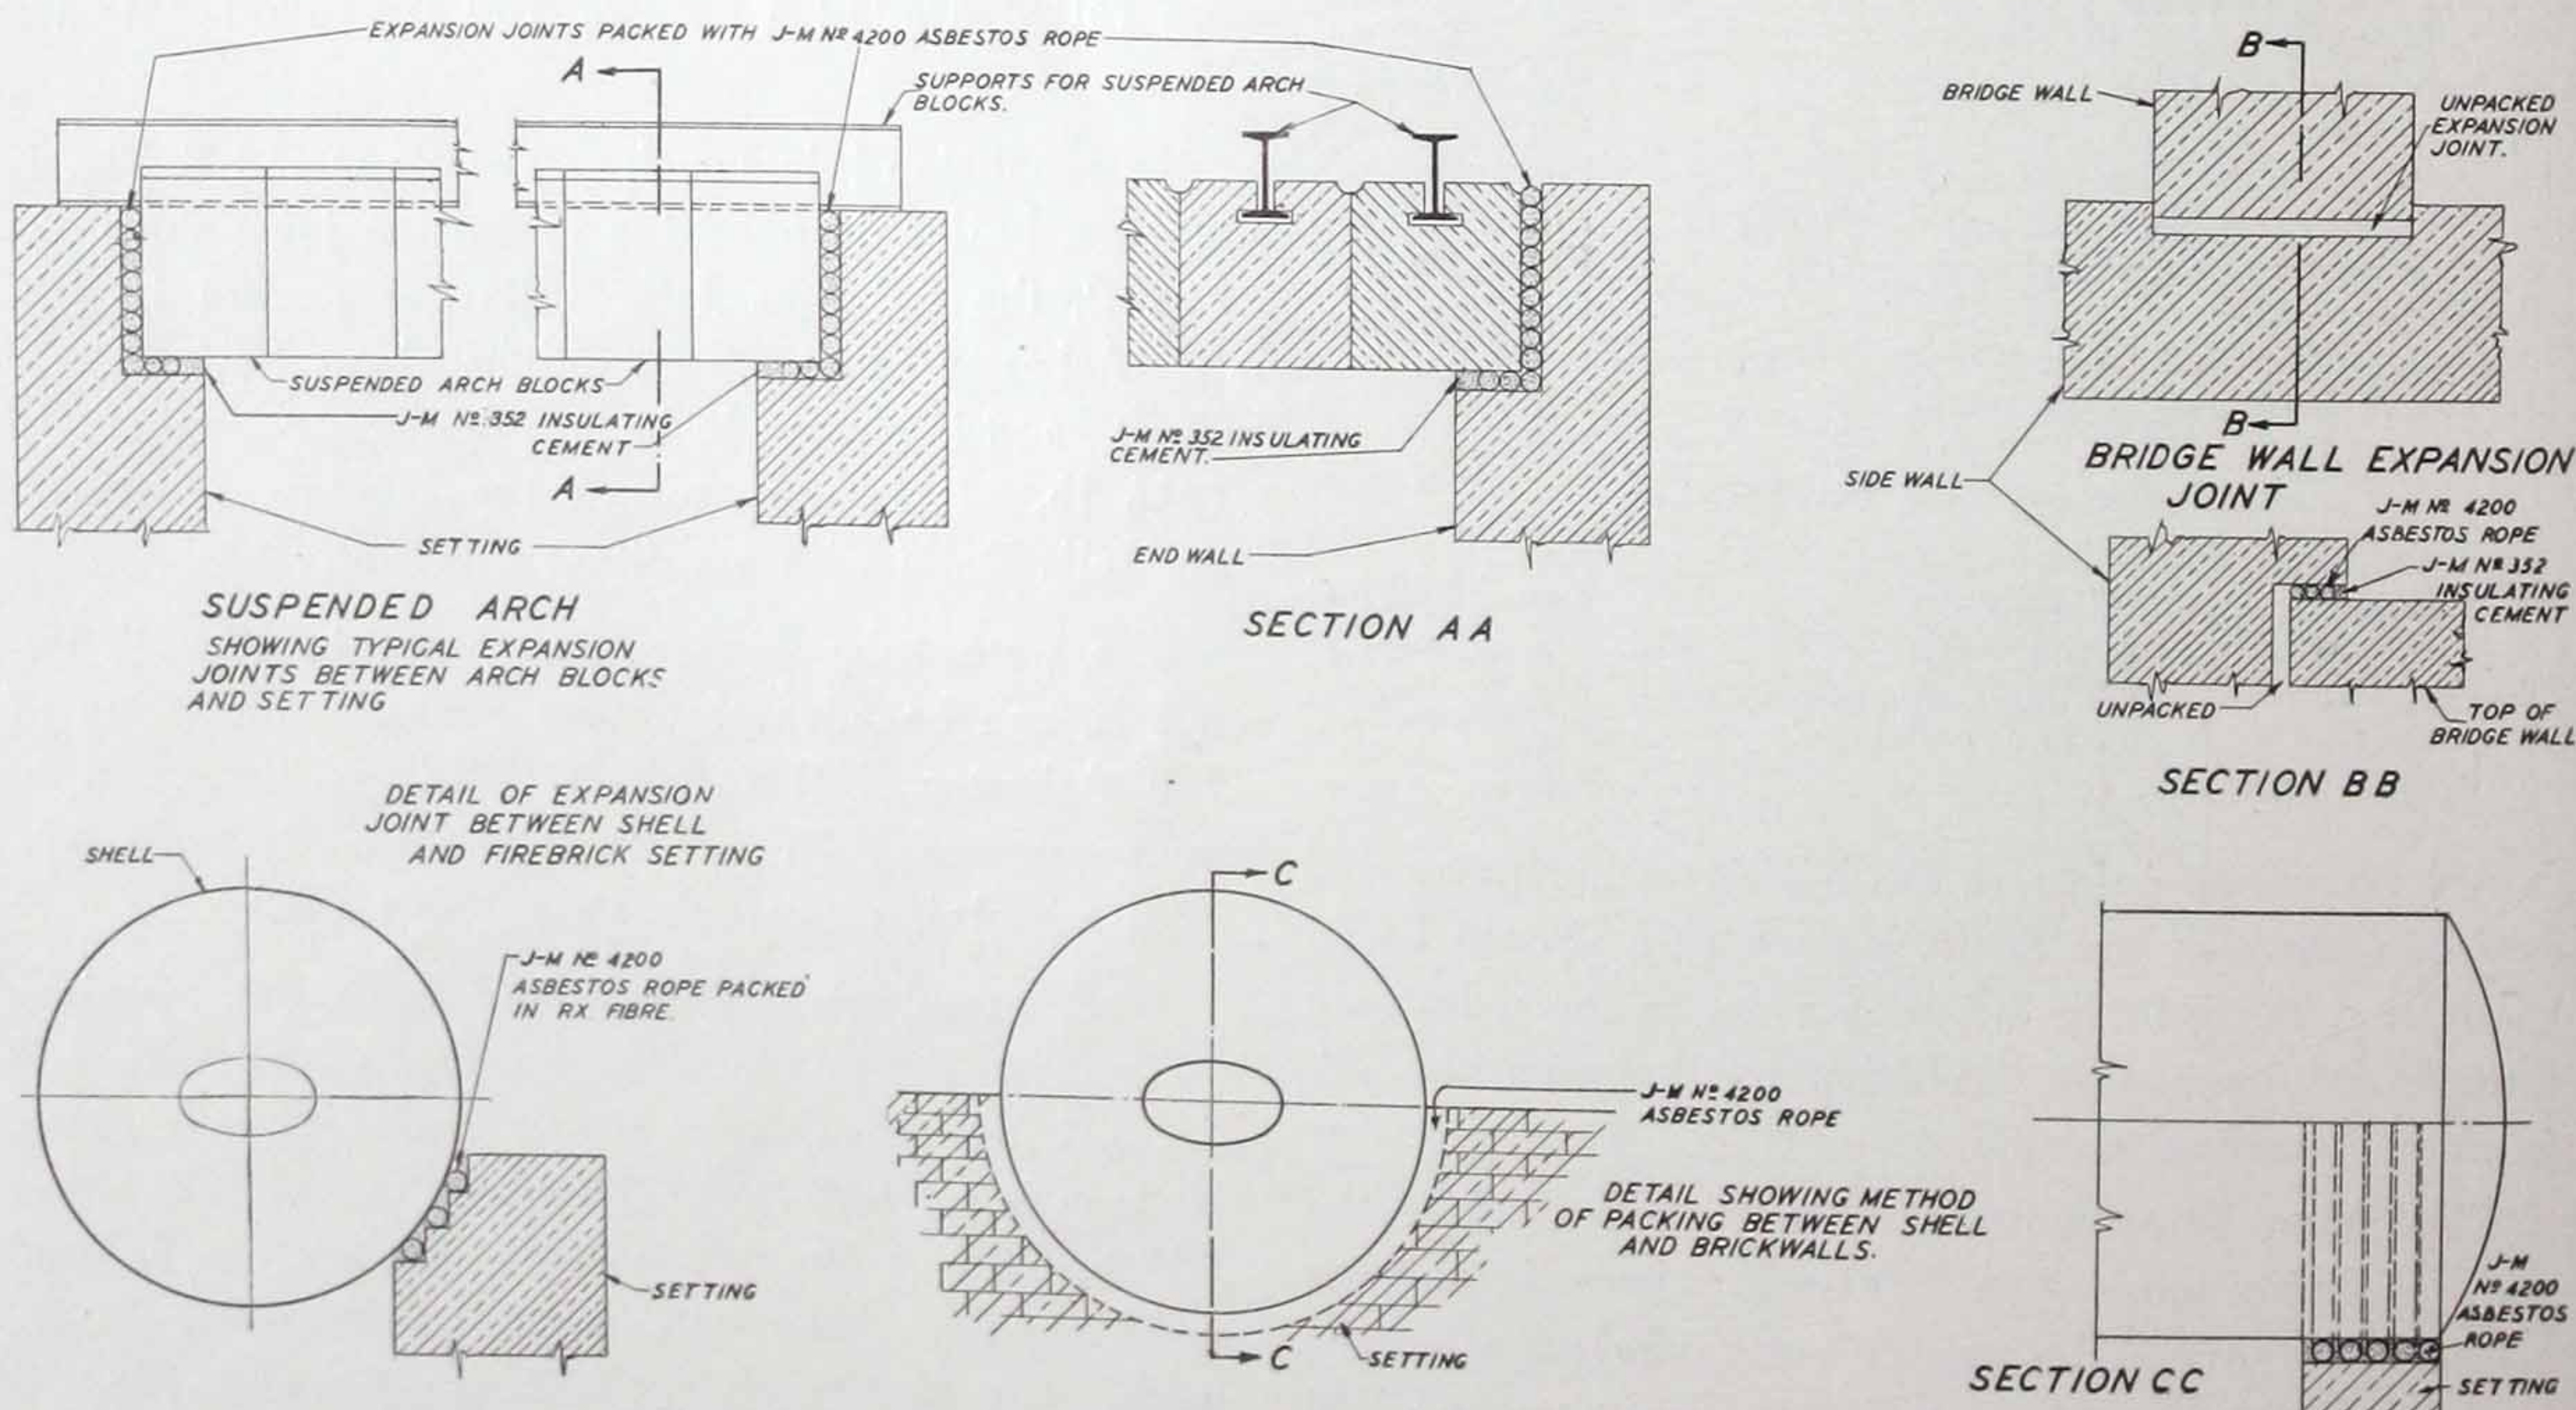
Expansion Joints at Suspended Arch, Bridge Wall and Steam Drum
